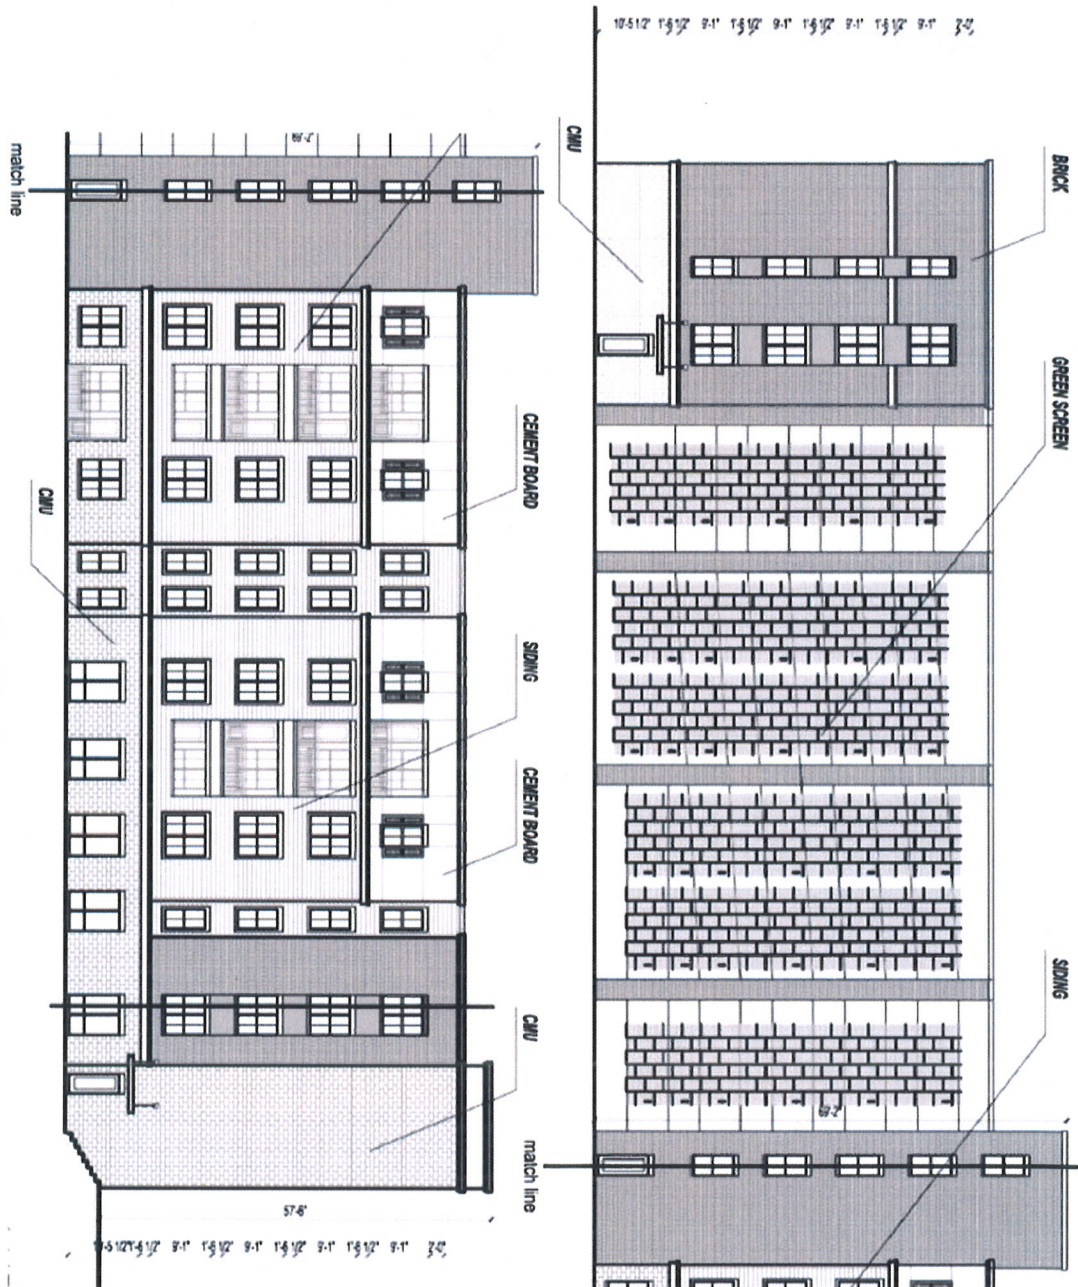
H Subarea C Conceptual Elevations
